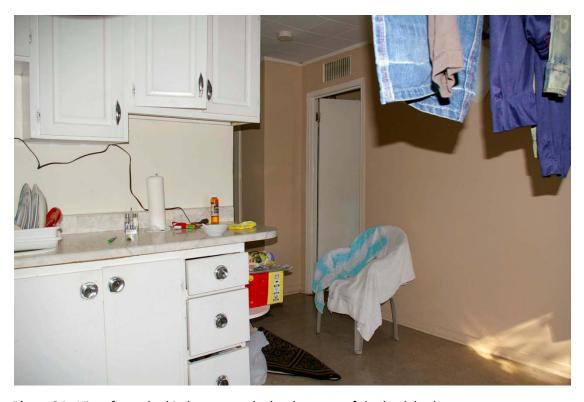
View from the kitchen towards the doorway of the back bedroom.
